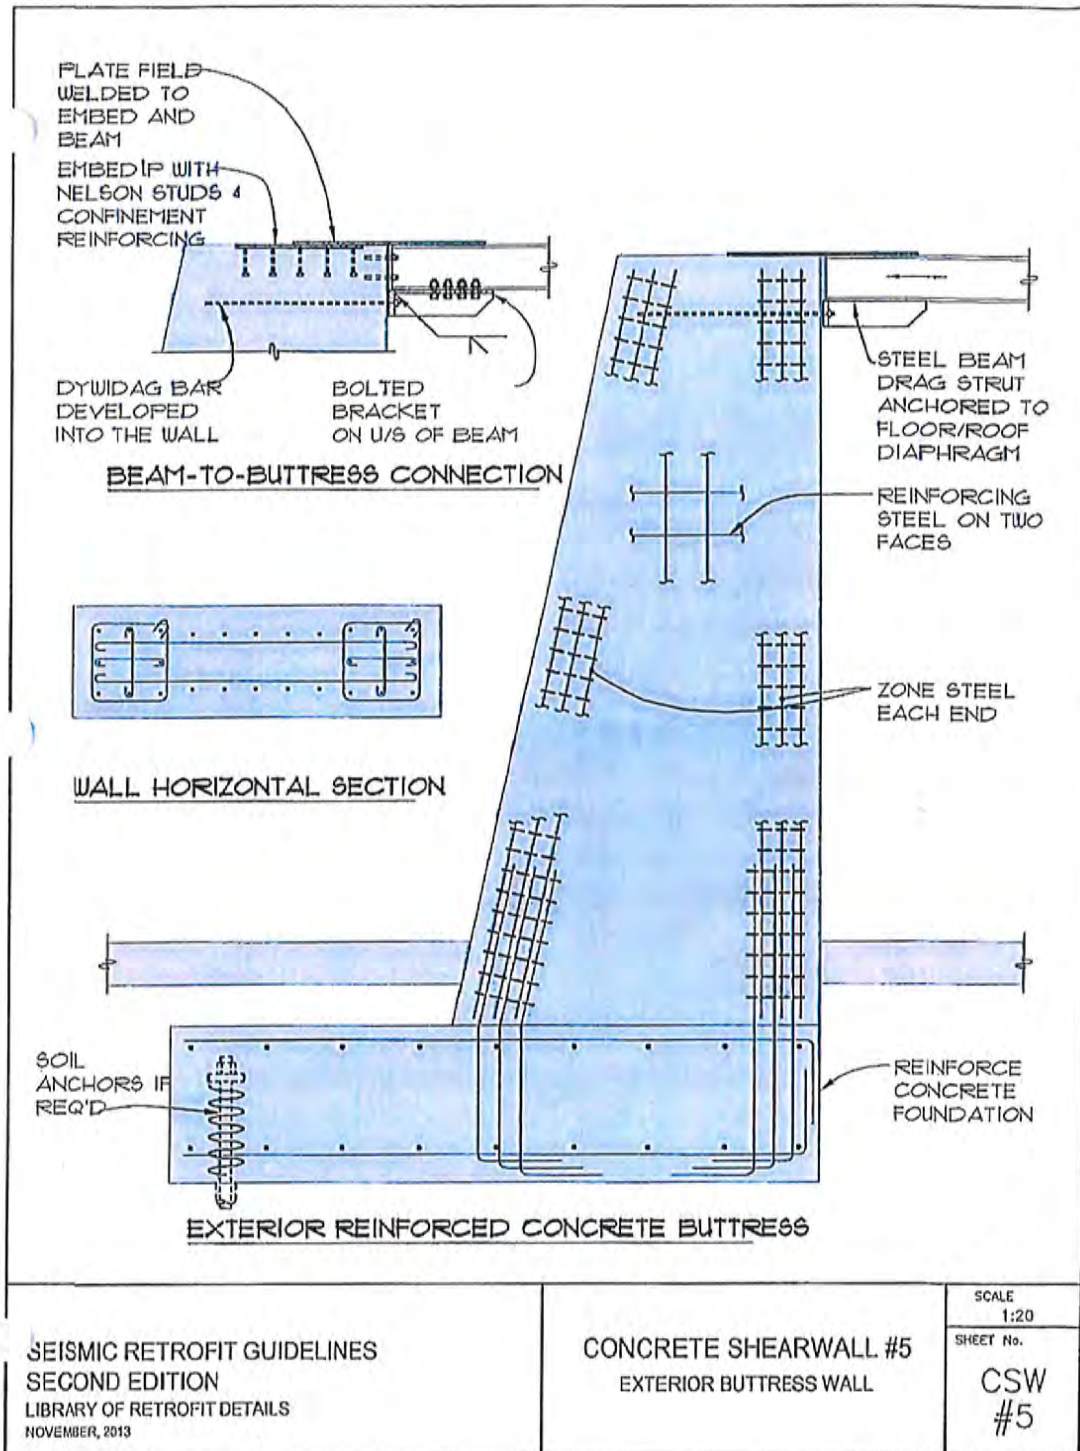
Reinforced concrete exterior buttress wall detail complete with soil anchor
